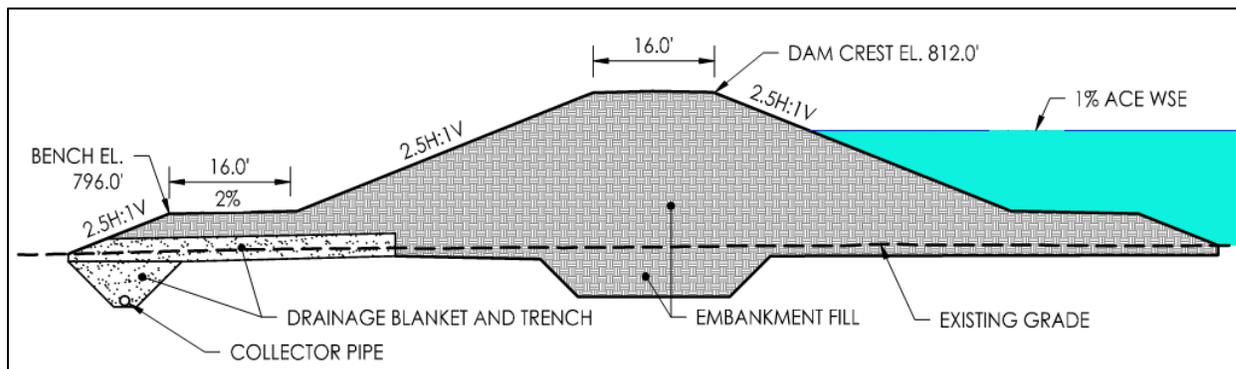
Typical Dam Embankment with Drainage Blanket and Trench
